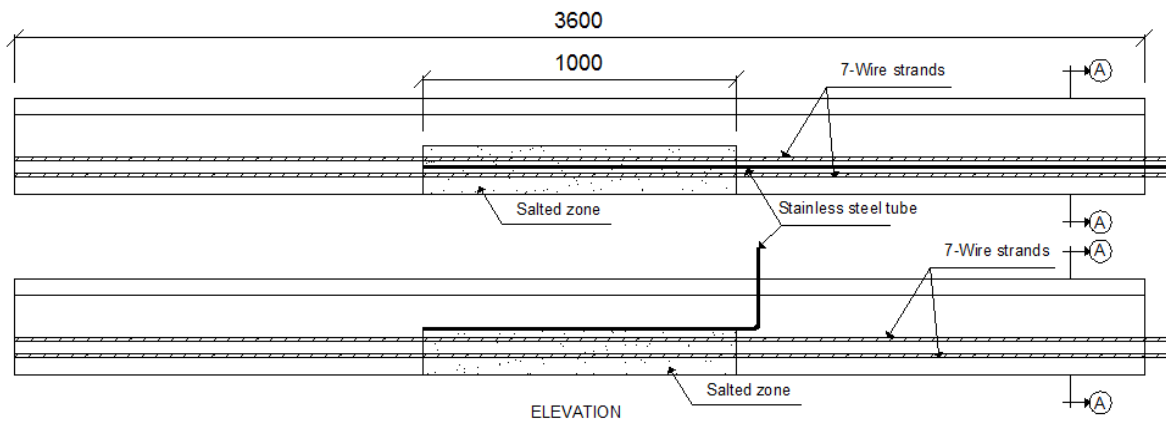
Stainless steel tube configurations for the beams with two prestressing strands
